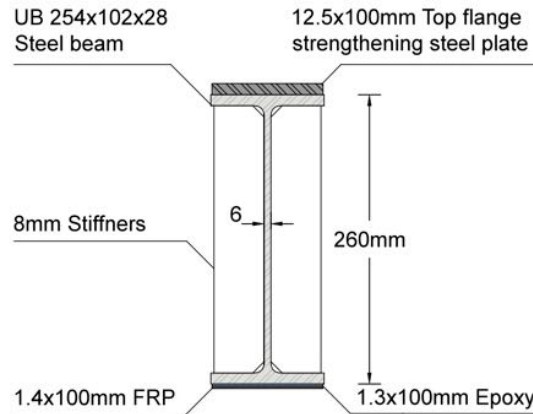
Cross section of a CFRP strengthened test specimens.
